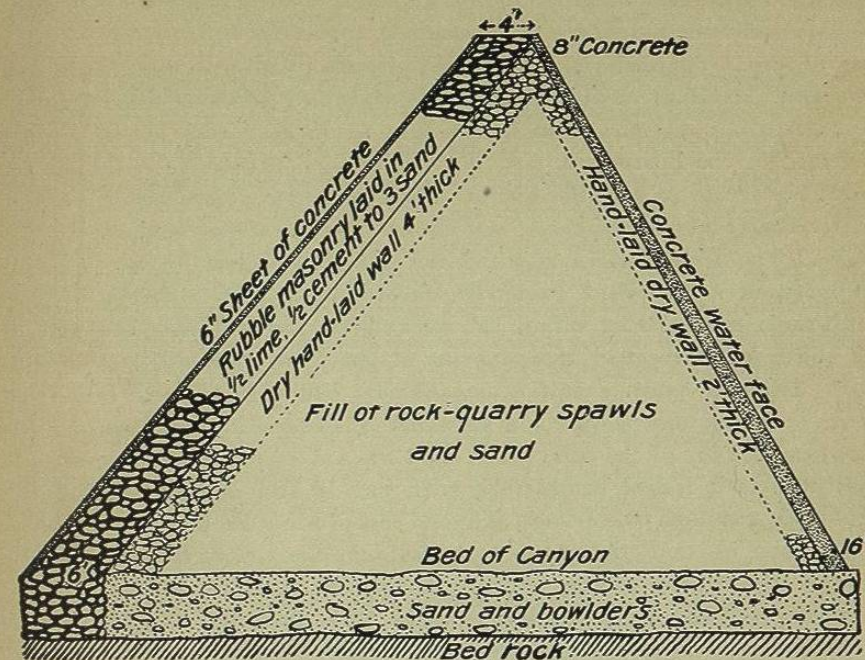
SKETCH OF RECONSTRUCTION OF CHATSWORTH PARK ROCK-FILL DAM.
